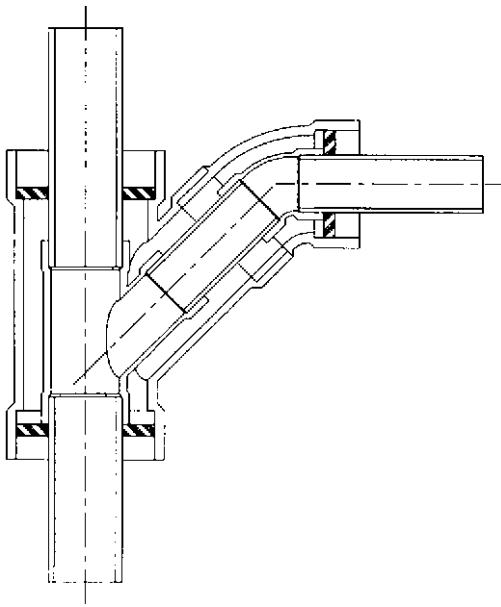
Example of thermoplastic reducing long-turn wye using molded code approved carrier fitting. (*Orion Fittings, Inc.*)
